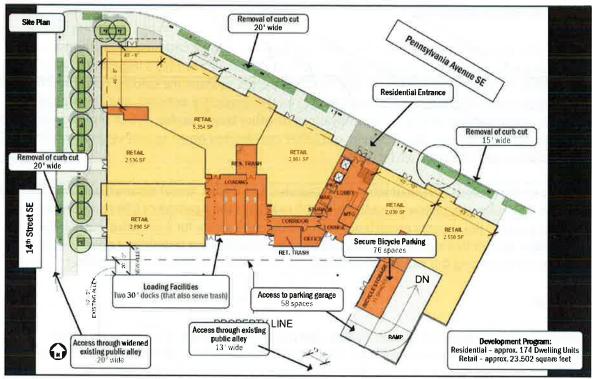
Site Design and Access (Source: Gorove/Slade)
